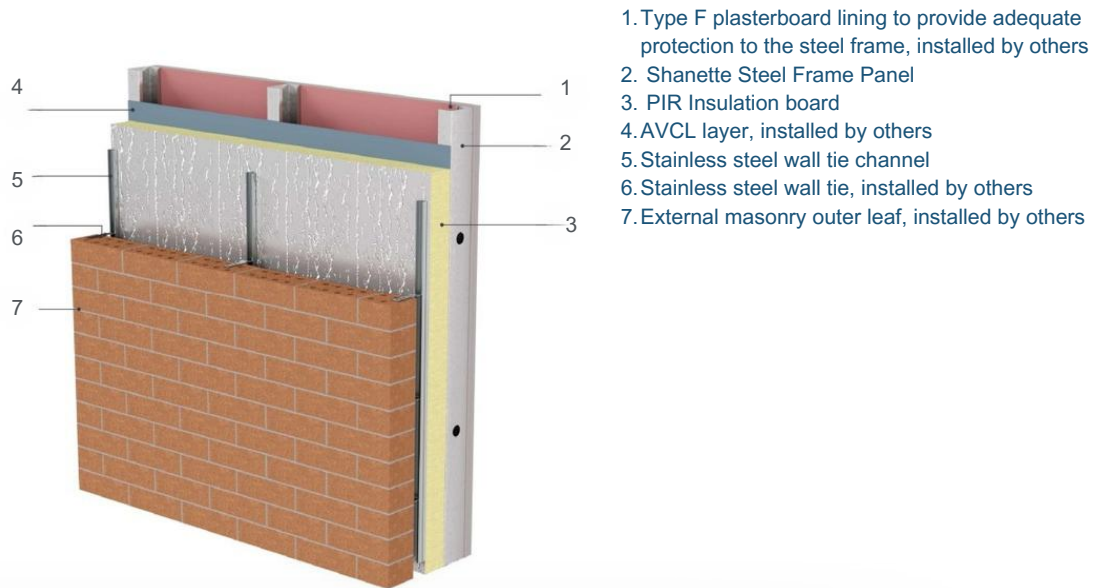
External Wall with PIR Insulation & Masonry Outer Leaf – Warm Frame
